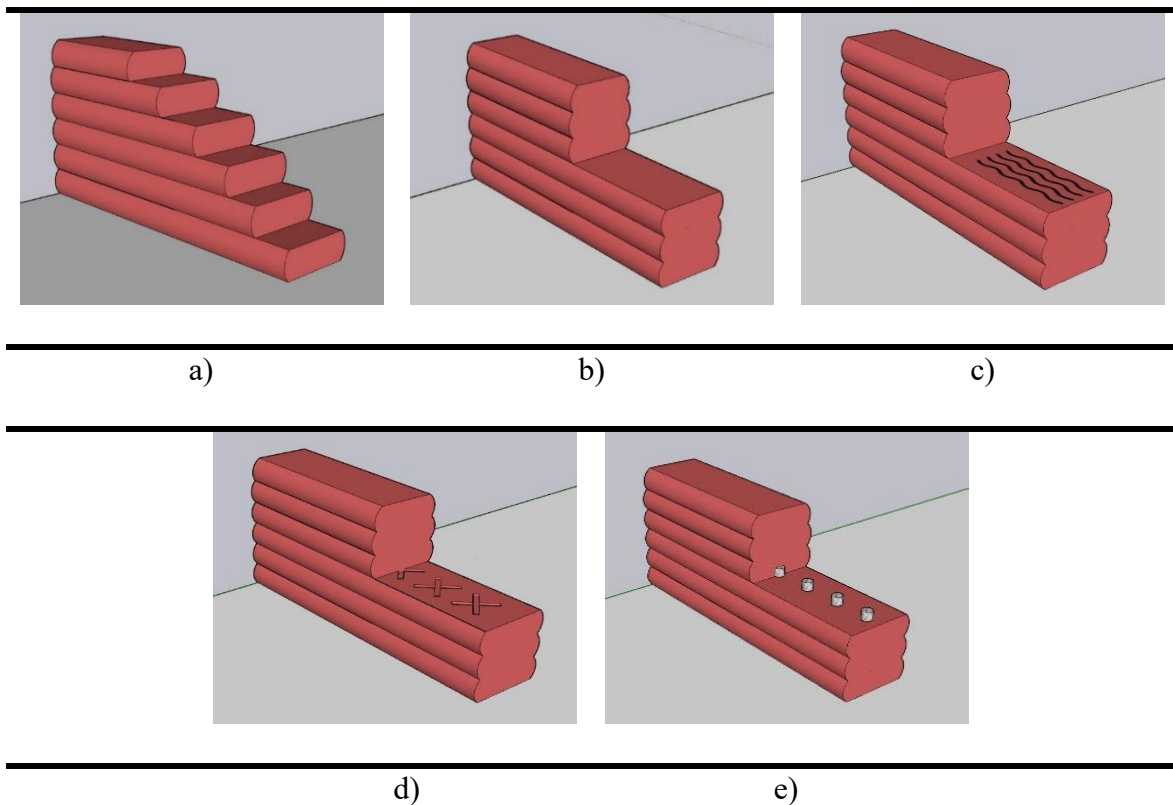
Schematic representation of a) continuously printed 6-layered specimen (FCA), b) 3+3 printed specimen with no treatment (PCA), c) 3+3 printed specimen with wetting treatment (PCA-W), d) 3+3 printed specimen with chipping treatment (PCA-C), e) 3+3 printed specimen with shear studs (PCA-S).
